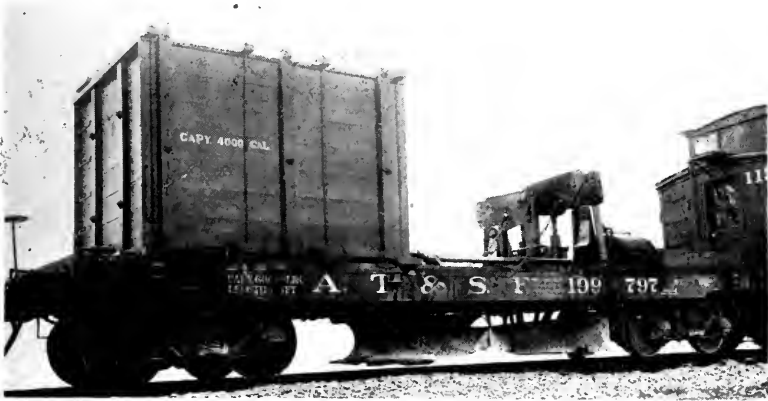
CAFFERTY-MARKLE BALLAST SPREADER AND FORMER WITH PLOW AND WINGS RAISED FOR HANDLING ON ROAD.
